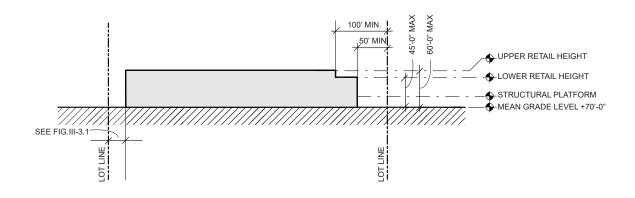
BUILDING HEIGHTS - RETAIL SITE A; OFFICE
